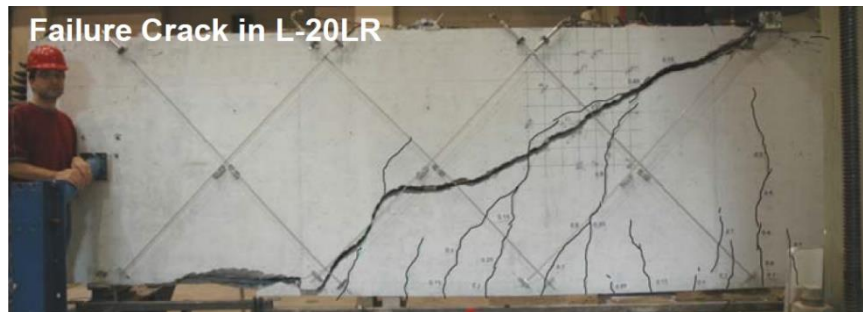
Shear failure, crack pattern on specimen L-20LR (adapted from Sherwood, 2008)
